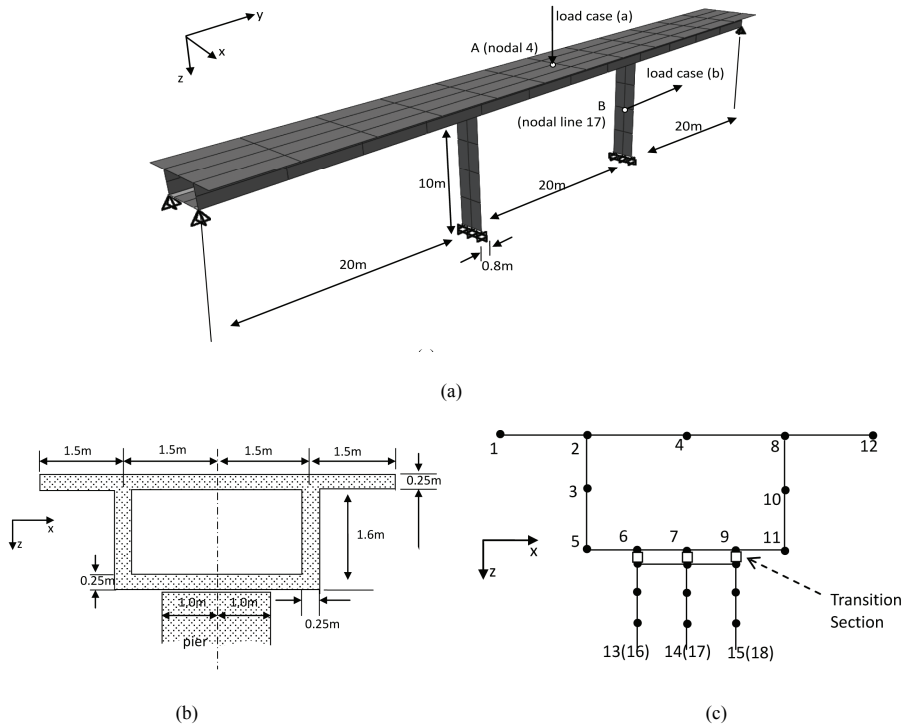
Three-span box girder bridge (a) 3D bridge model; (b) transverse cross-section through the pier and deck; (c) numerical model.
